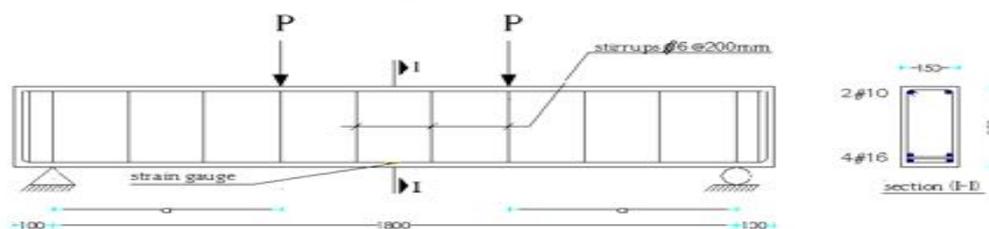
Details of reinforcement and position of loads for control beam BB0 (Dimensions in mm).
